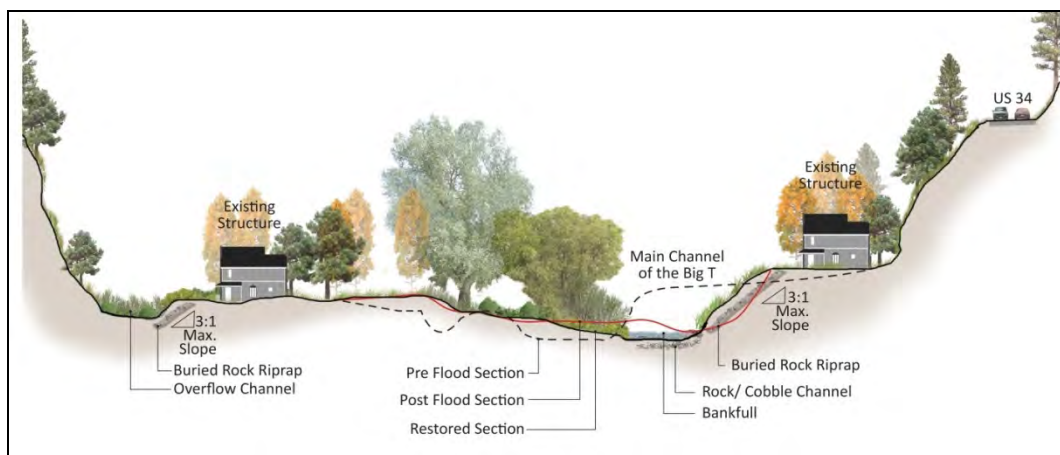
Illustrative section near Jasper Lake Road – view looking downstream.
